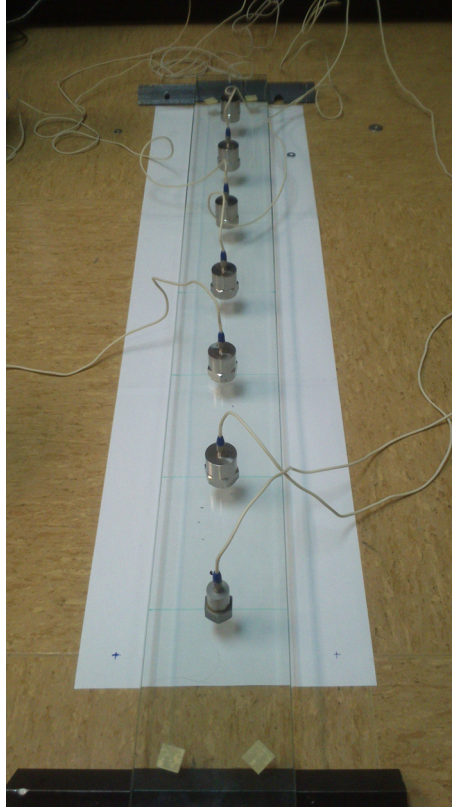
Monolithic glass beam instrumented with 7 accelerometers.
